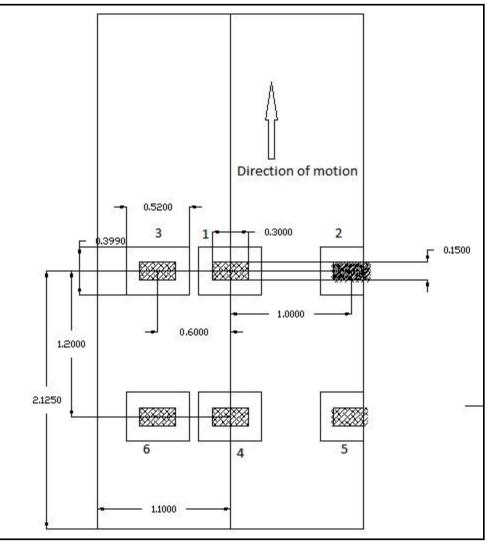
IRC CLASS AA EHEELED LOAD ON RCC I GIRDER BRIDGE
